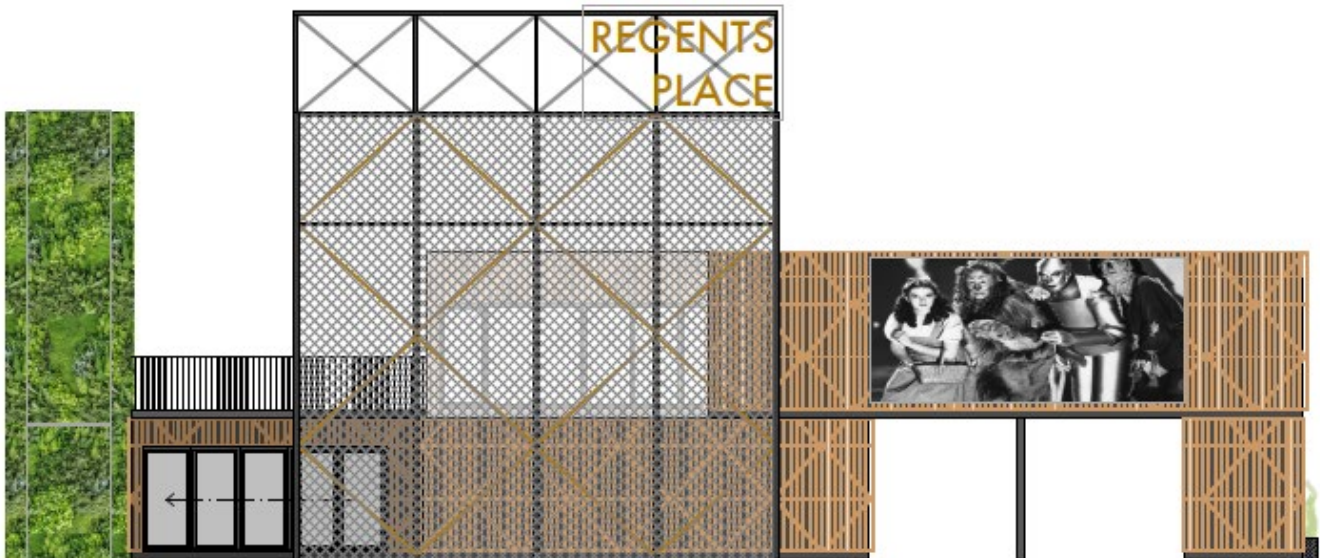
North elevation of the proposals, viewed from the Regent's Place plaza.
